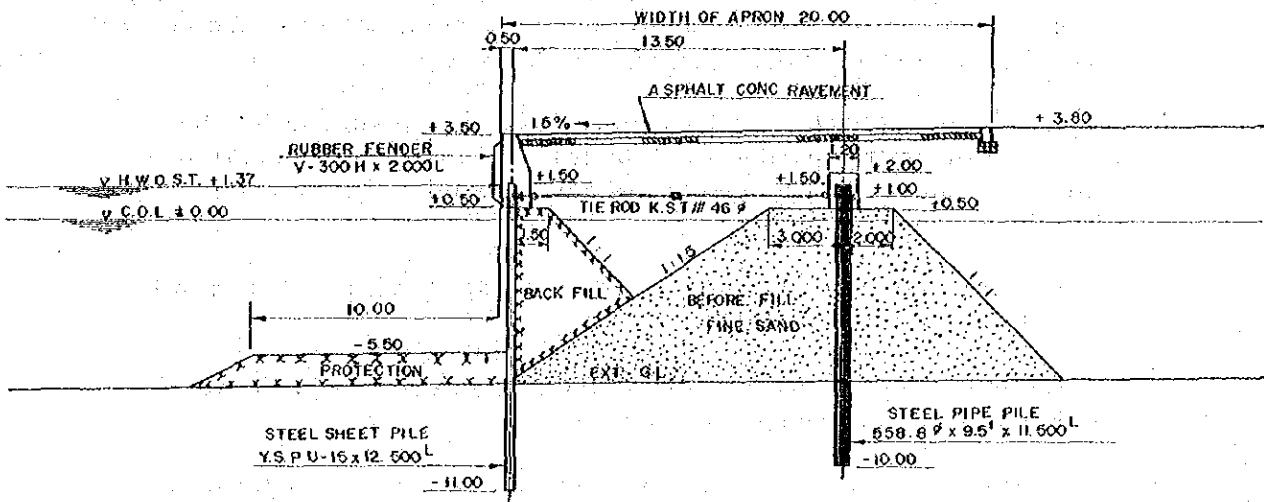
SECTION OF - 5.5 M QUAY WALL UNIT ; m
